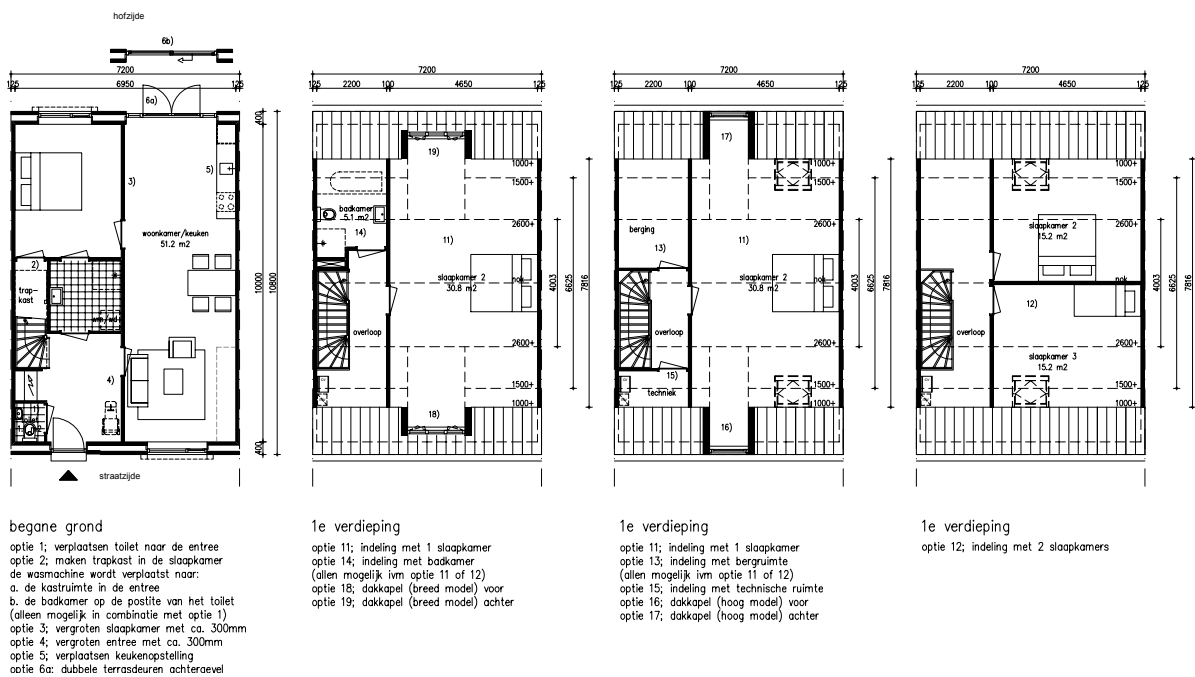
Floor plans and section of the housing unit with a width of 7.2 meters and several options for the first floor, image by INBO
